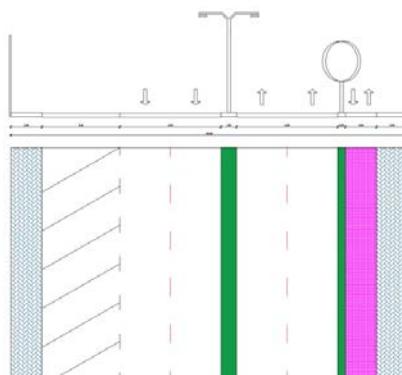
Geometric cross section of streets Planirana 11 and Planirana 12
